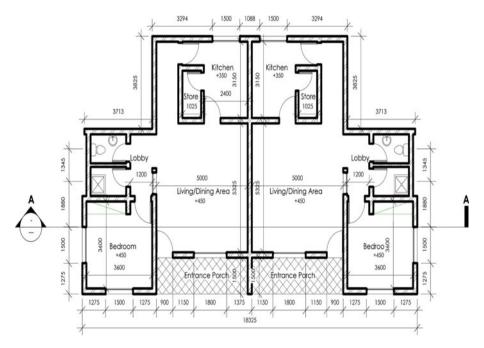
Floor plan of semi-detached 1-bedroom core housing units
